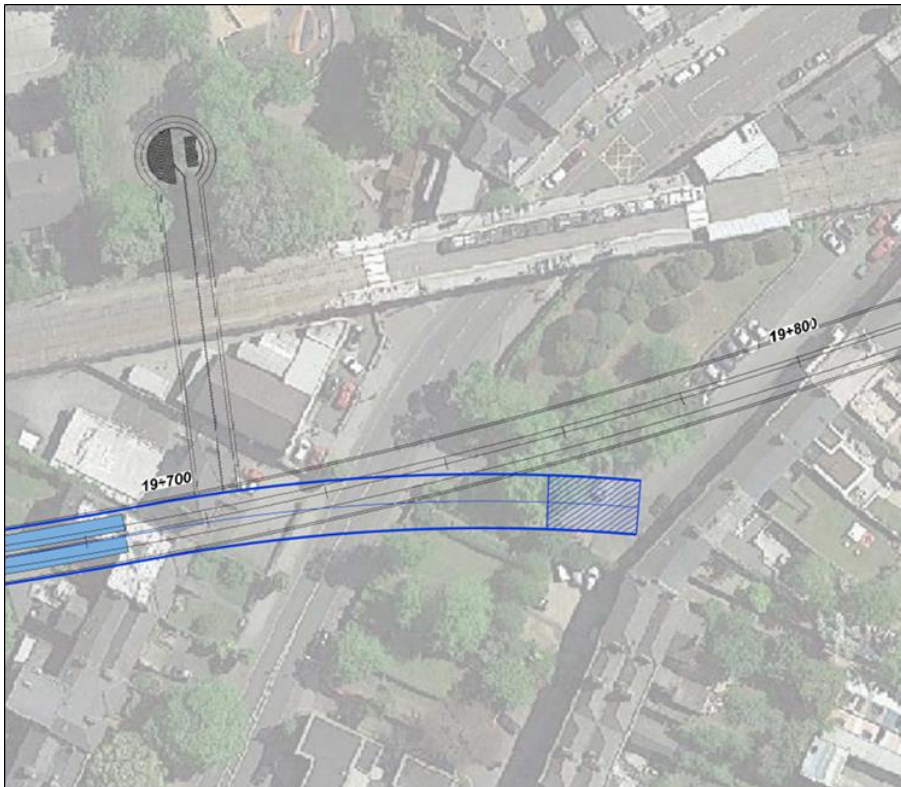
Option 1 - Shaft in Ranelagh Park Playground, close to Ranelagh station.
